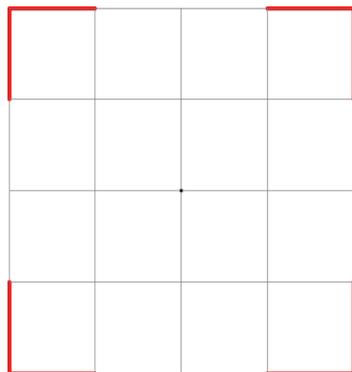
(a) Structural Plan for X-braced RC Frame (Model-3)
